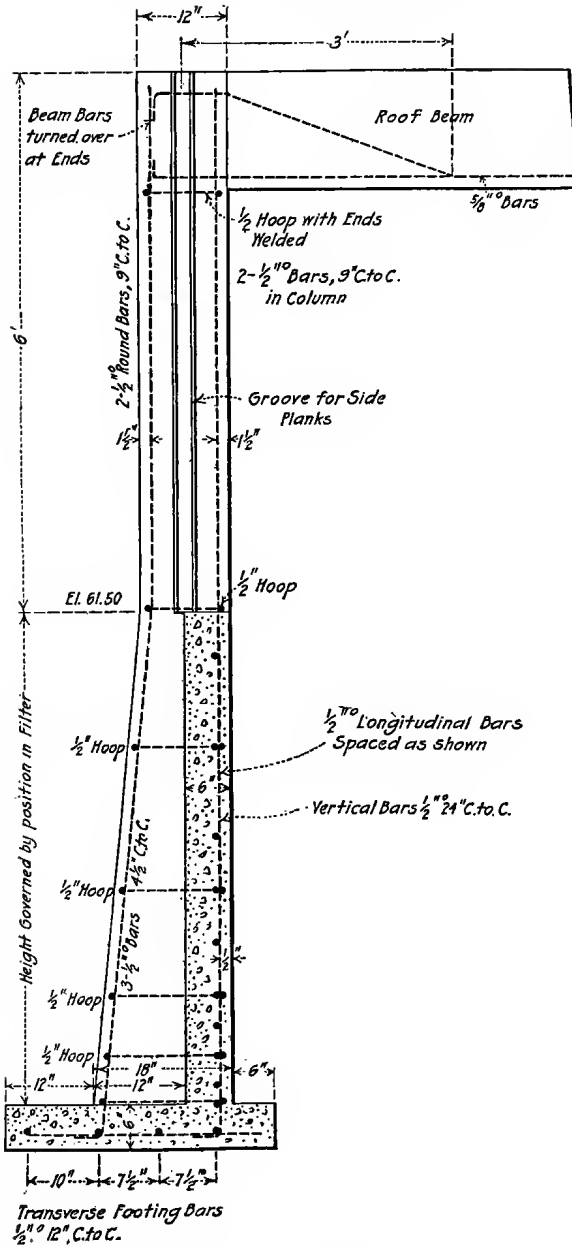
Wall and roof beam of trickling filter at Gloversville, N. Y.
